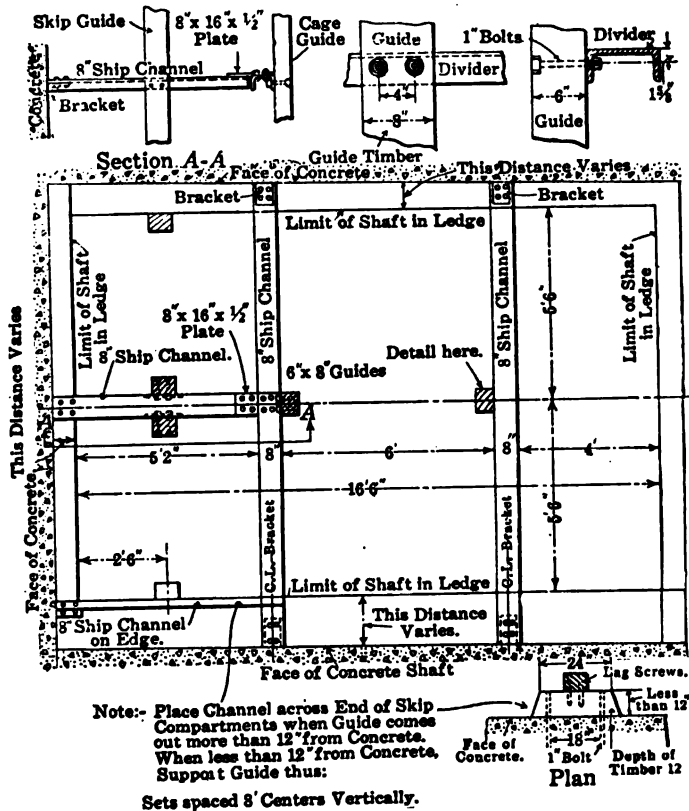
STEEL WORK IN CONCRETE PORTION OF ROGERS SHAFT.
